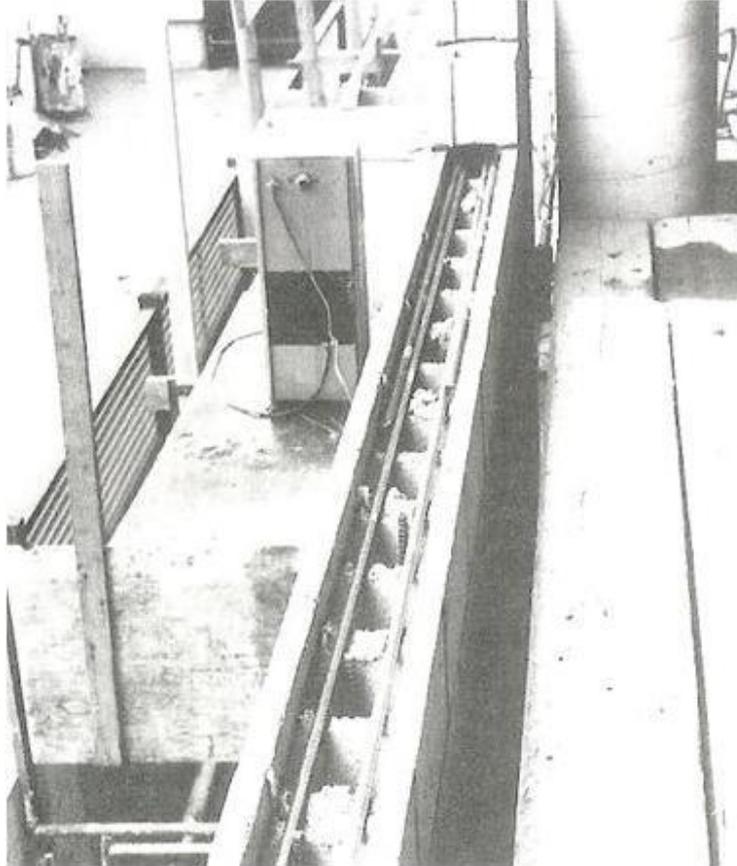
Horizontal reinforcing bars positioned in a bond beam that will be solidly grouted.
